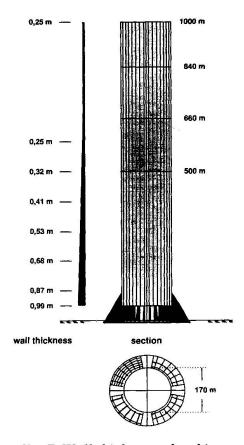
Wall thickness of a chimney 1.000 m high and 170 m in diameter
